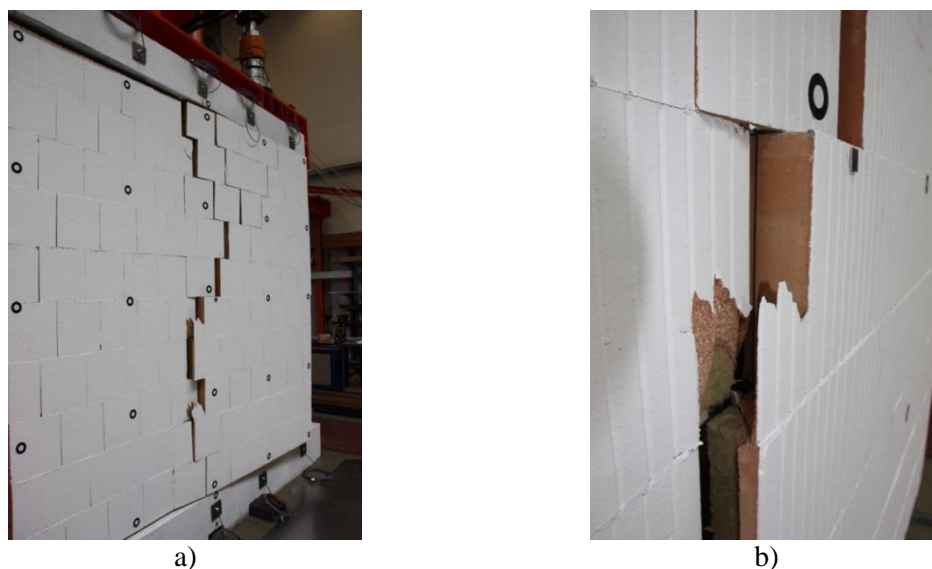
a) Out-of-plane deformation of the wall and b) damage within the wall at the end of the Test BO
